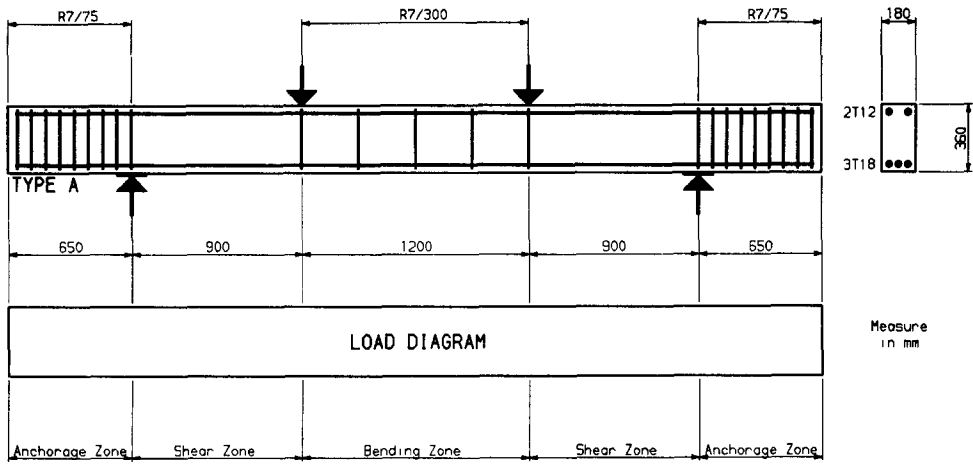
Alkali-silica reacted beam. Geometry, reinforcement and load diagram.
